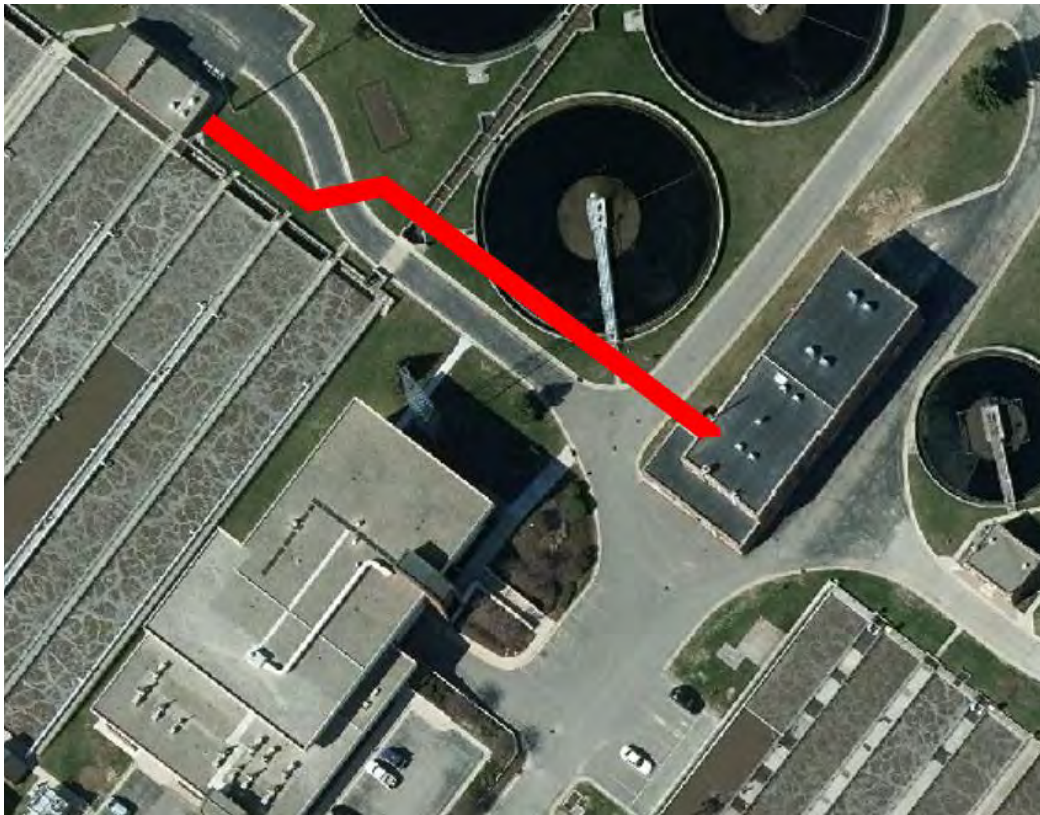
Above-grade piping between Aeration Building 4 and East Blower building
